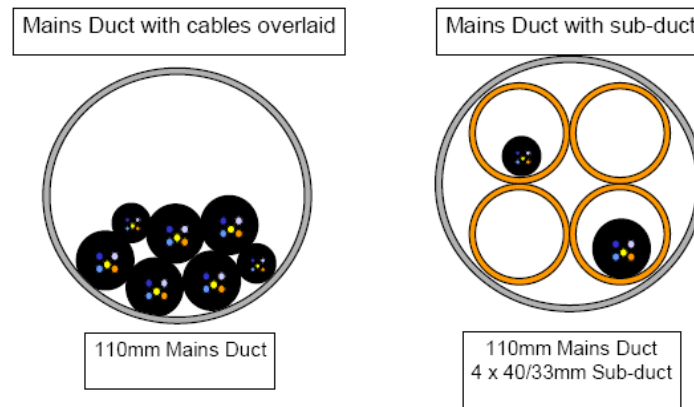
a) section of duct with fiber cables, b) section of duct with subducts and fiber cables (www.emtelle.com)
